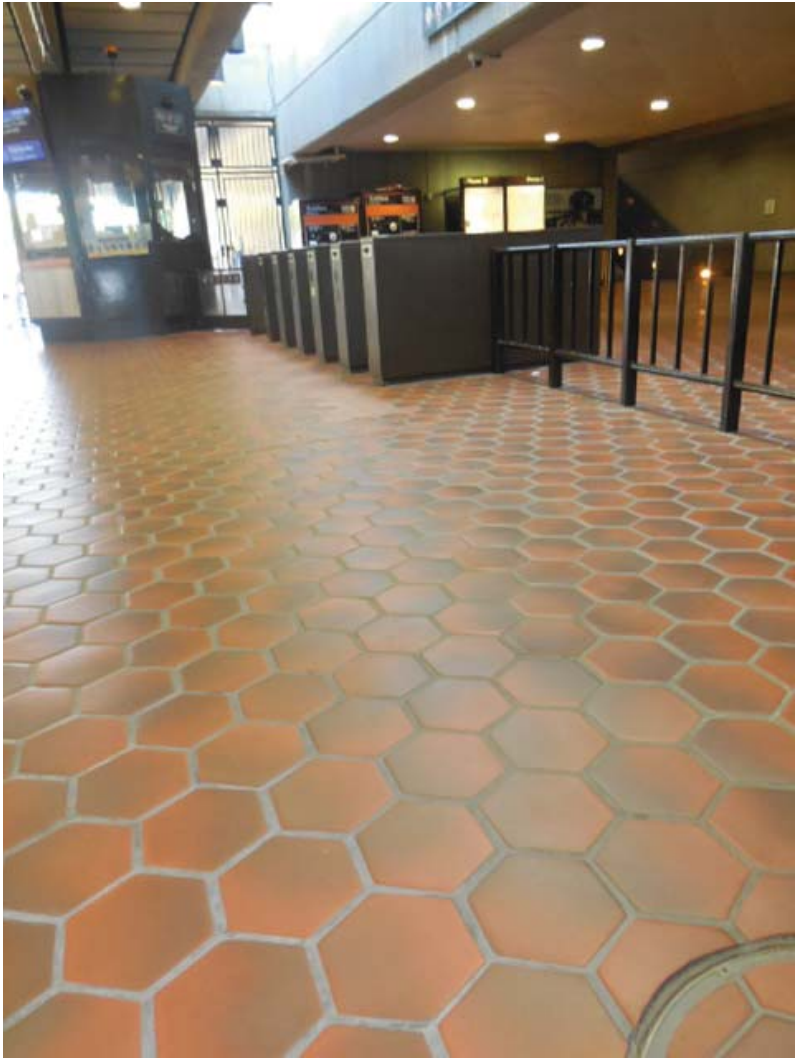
J02 Van Dorn Street – Mezzanine Level Handhole
